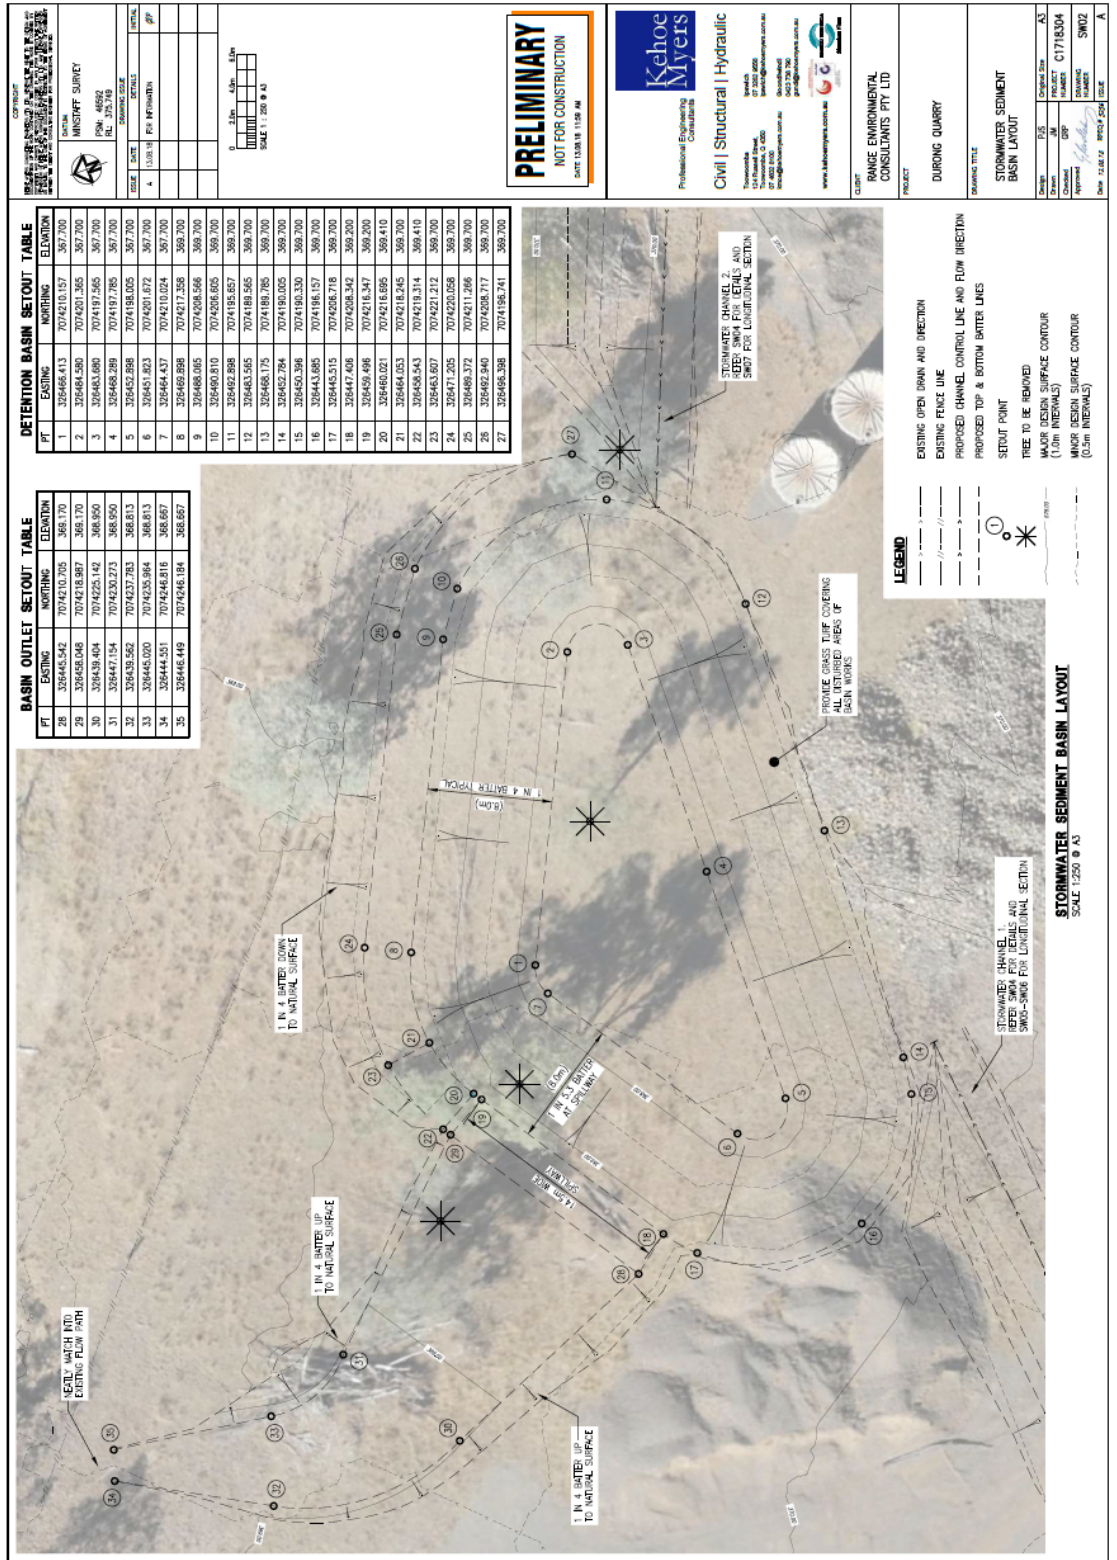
Stormwater Sediment Basin Layout (source: applicant)
